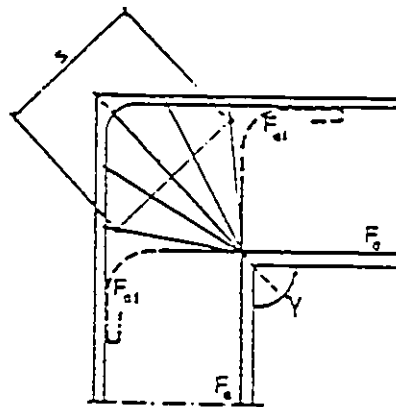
STANDARD CORNER LAYOUT RECOMMENDED IN RUSSIAN BUILDING CODE (Ref. 6)
